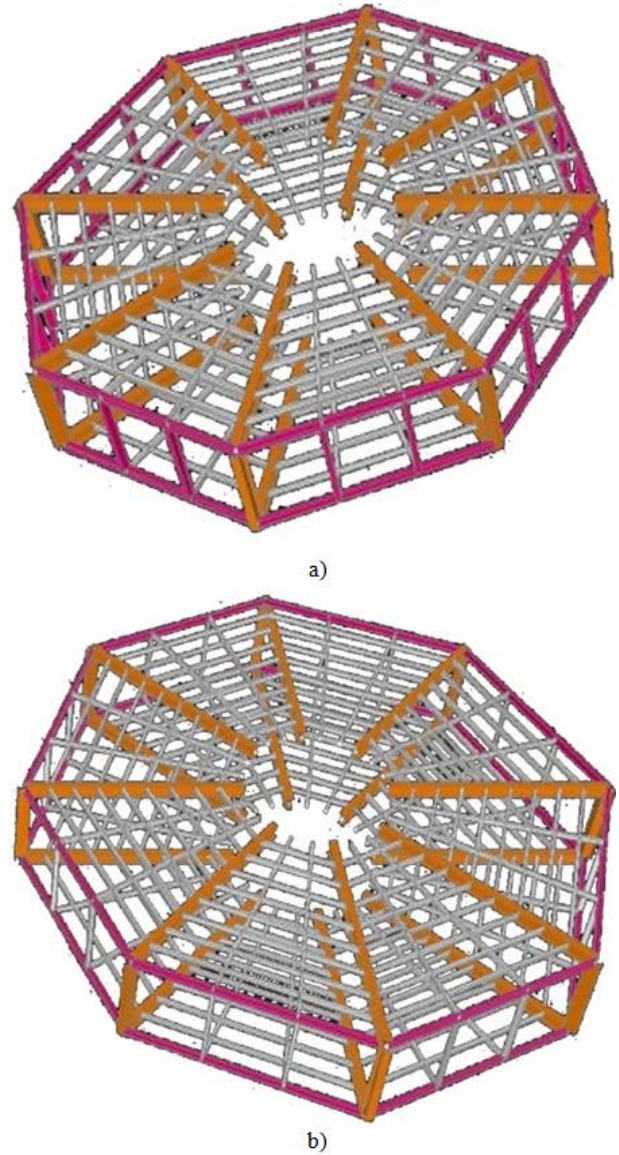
Structure a) Bar-restaurant (-10m); b) Hotel (+9m)
